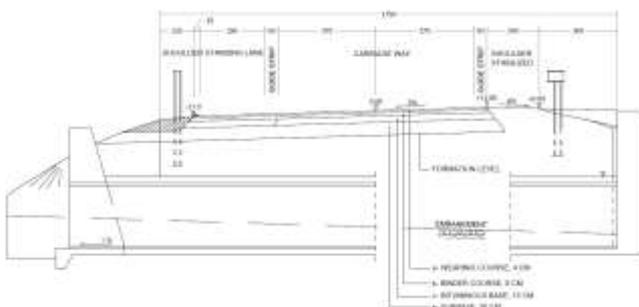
Typical pavement structures in Expressway No.1-Iraq (section R4/B)
